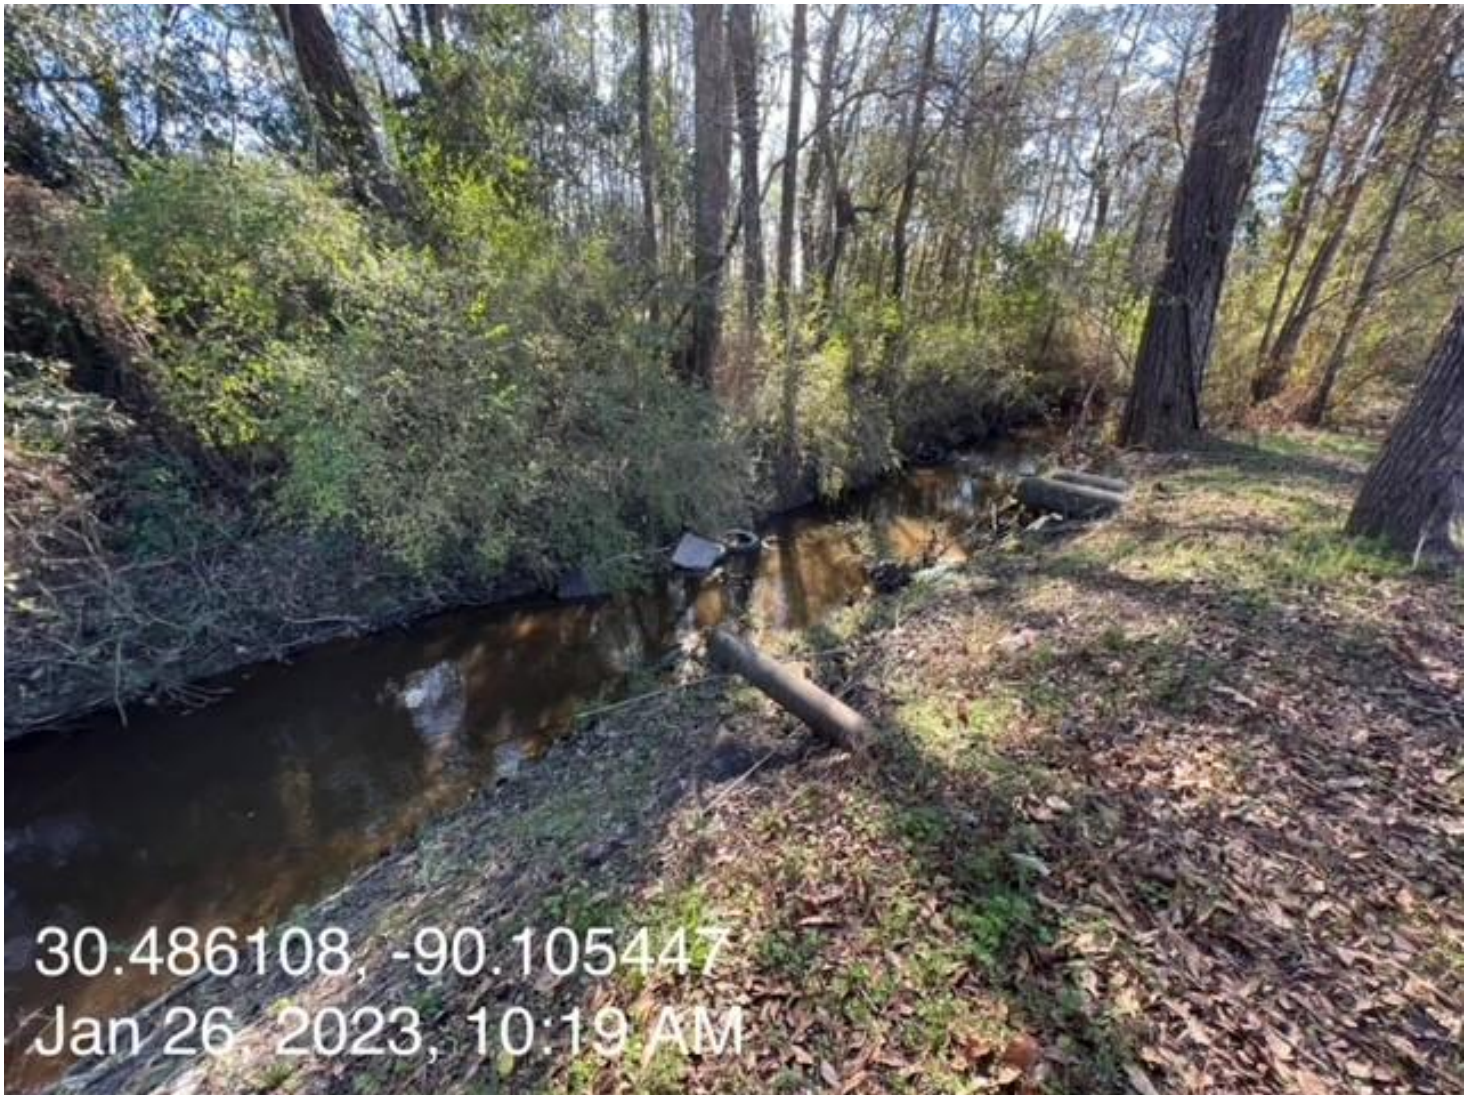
Facing South. Photo take from Mile Branch ROW.
